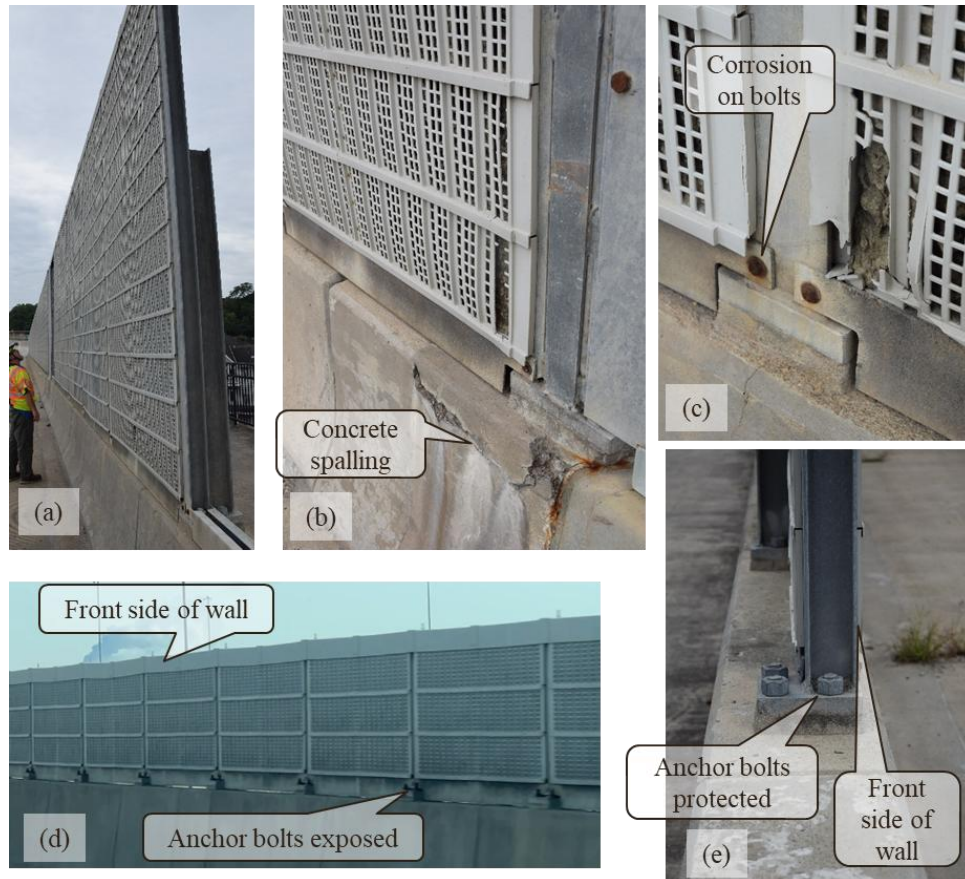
Photos of the Condition of Noise Barriers Constructed with Composite Panels: (a) Overall View with Barrier; (b) Closeup Showing Cracking at Intermittent Locations Near Panel-to-Post Connections and Concrete Spalling in the Barrier; (c) Closeup Showing Damage on Panels and Corrosion on Bolts Connecting Panels to Posts; (d) Exposed Anchor Bolts with Corrosion; (e) Anchor Bolts Protected from Salt Spray Showing no Corrosion
